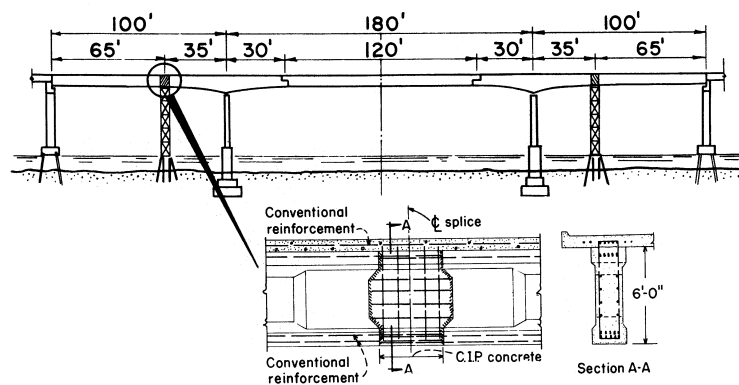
Temporary Bent Location and Splice of the Sebastian Inlet Bridge
